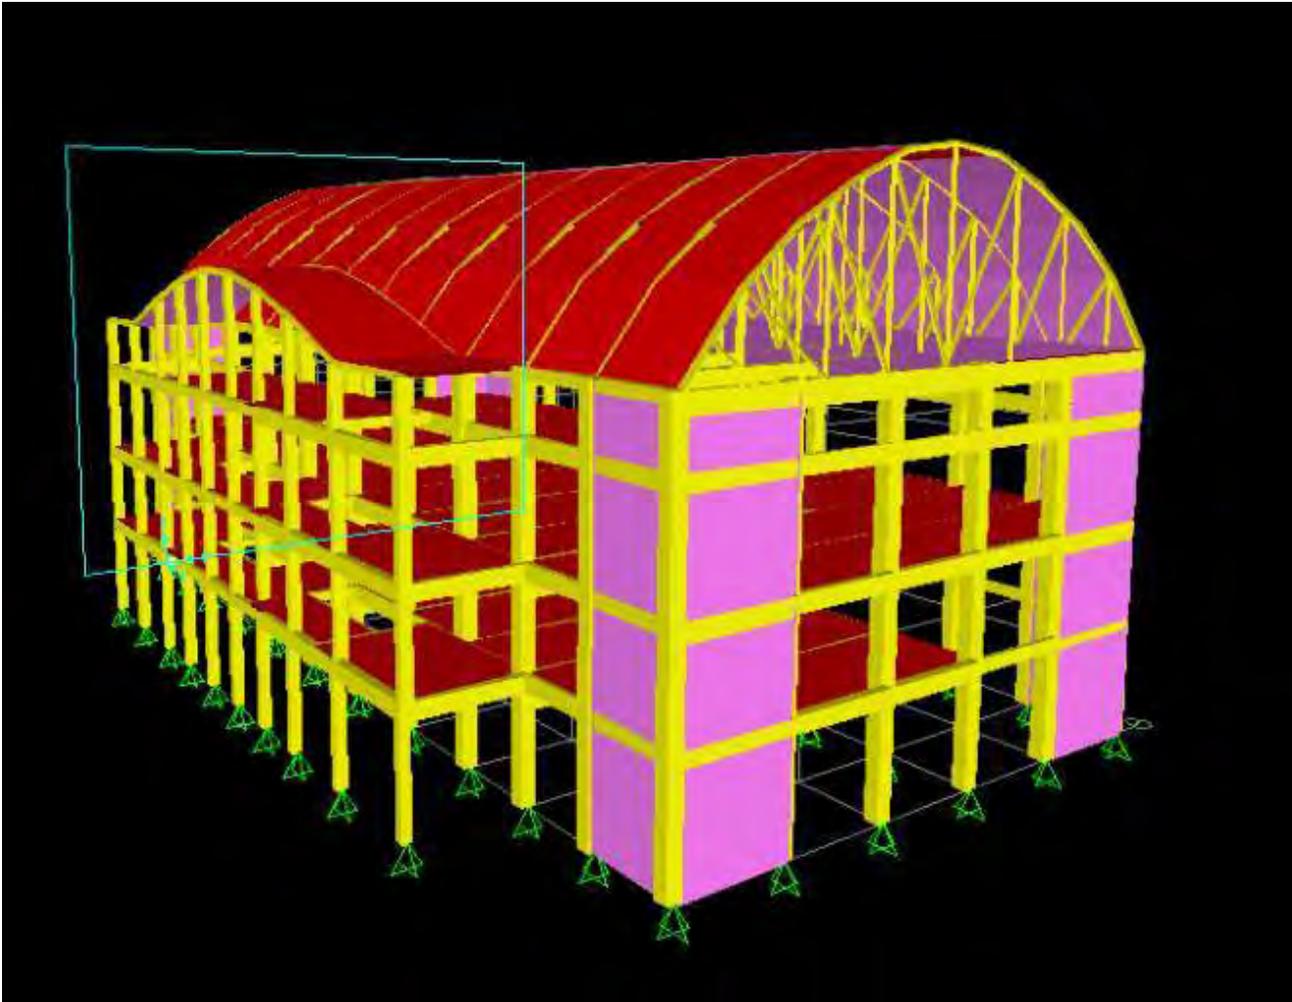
One option of Shear Walls Constructed in the Building's Corners (depicted in purple).
